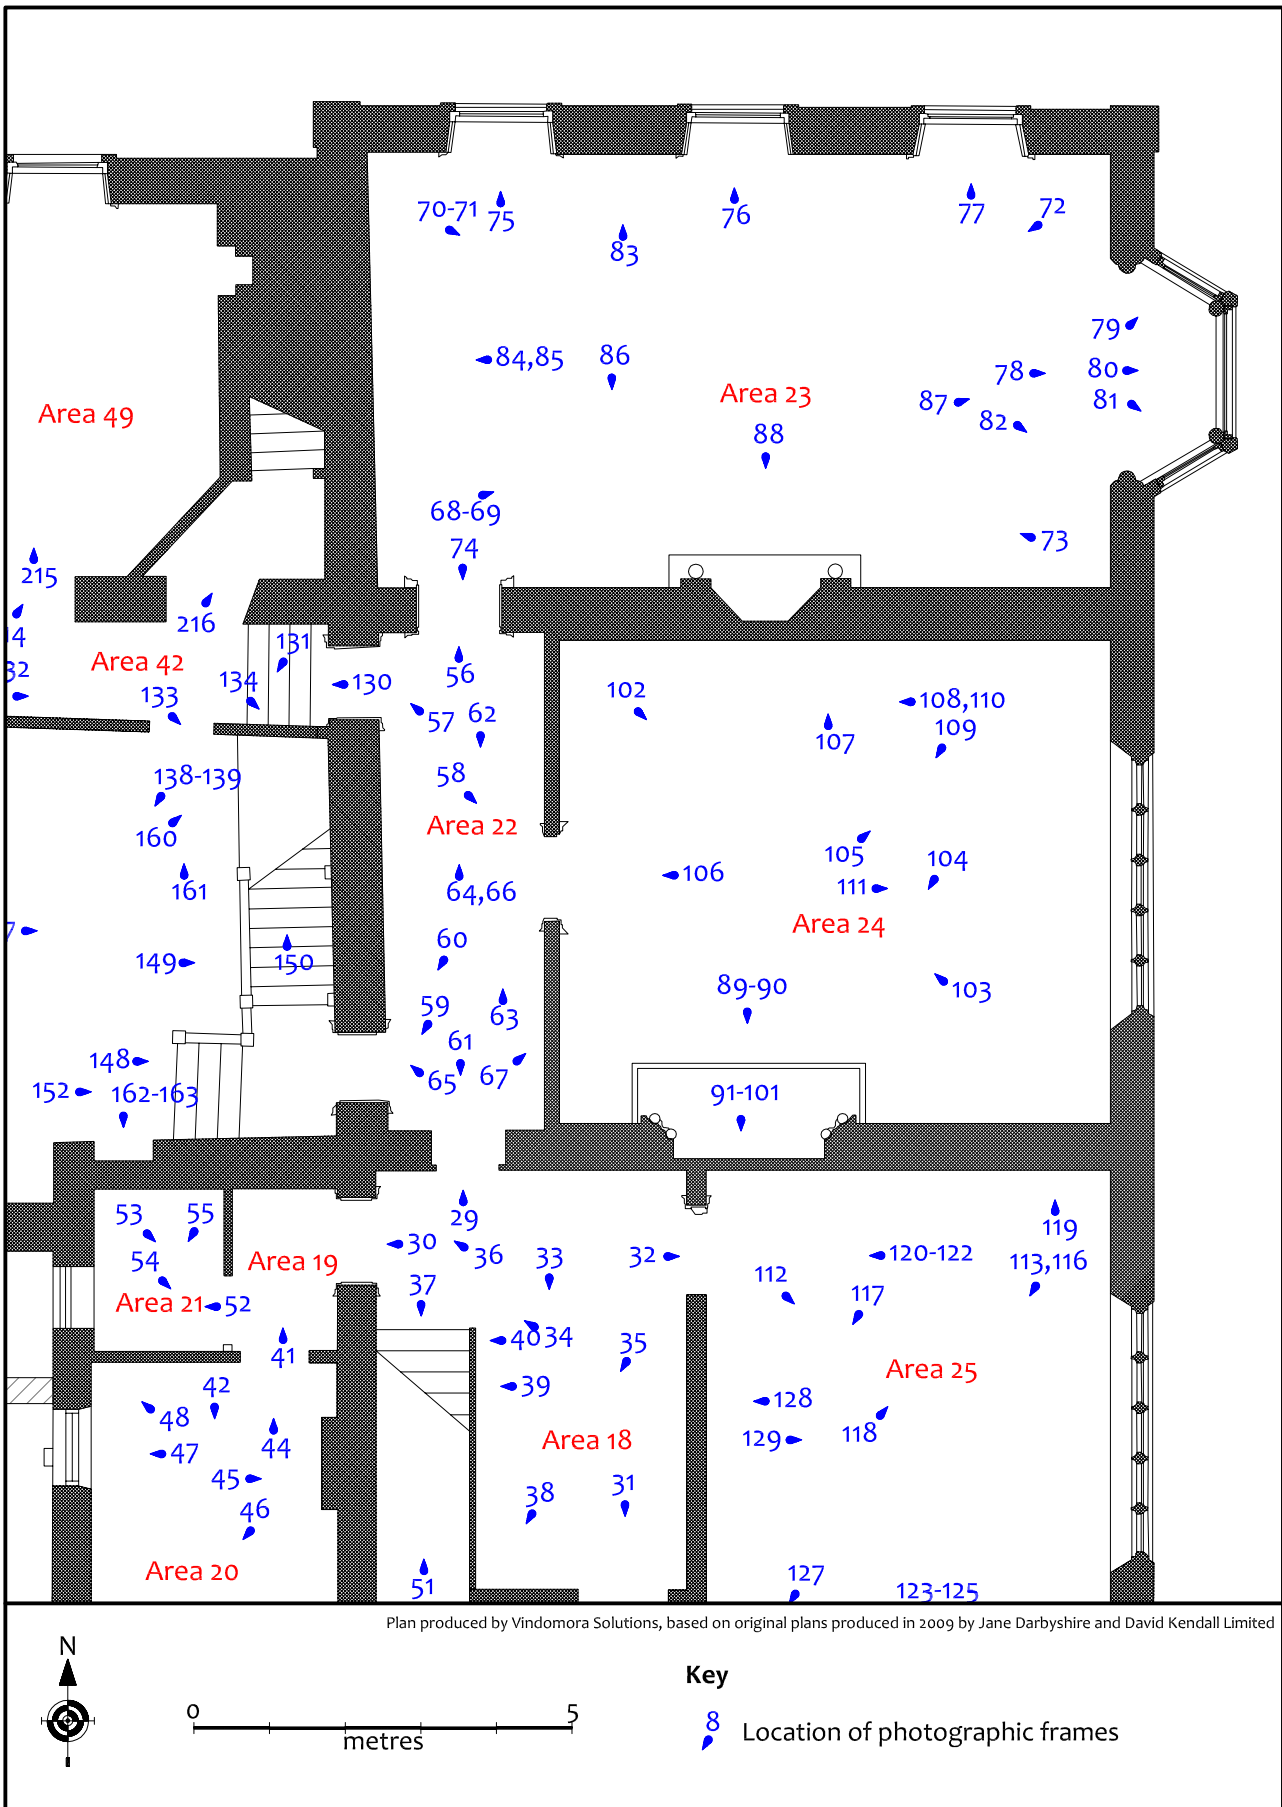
Ground floor plan showing location of photographic frames. Areas 18-24
